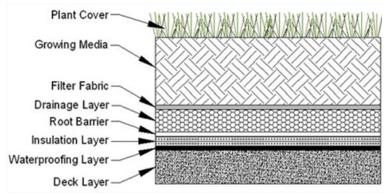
This image shows the different layers of a green roof that support plant growth and retain water for plant uptake while preventing ponding on the roof surface.
